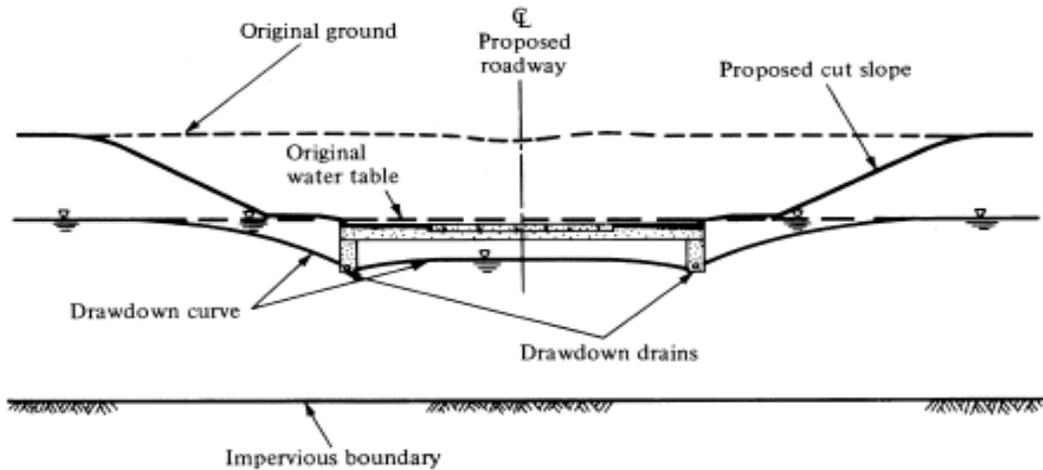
Symmetrical Longitudinal Drains Used to Lower Water Table
